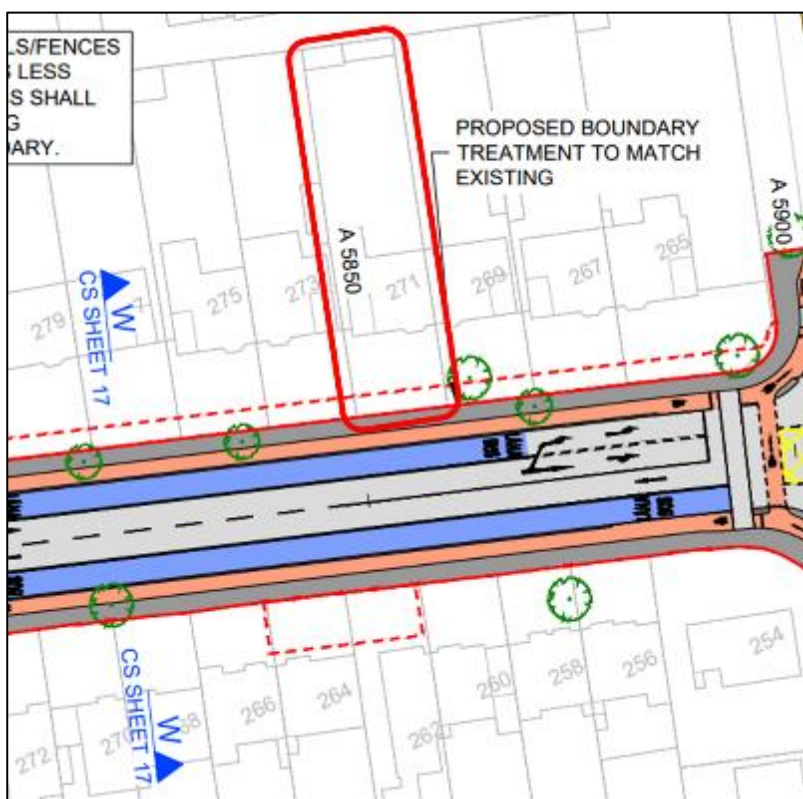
Proposed new Layout at 271 Navan Road
